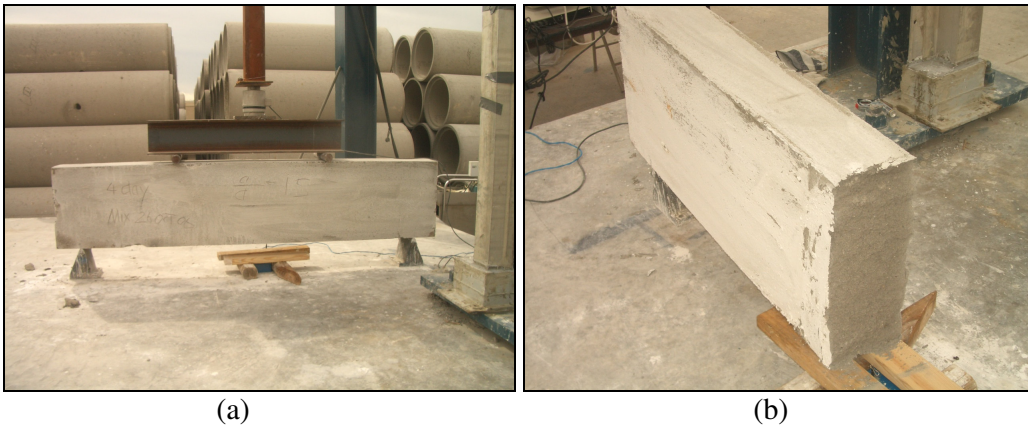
Beam for 2<sup>nd</sup> batch concrete cast on 10/26/06 for 3 day test;
